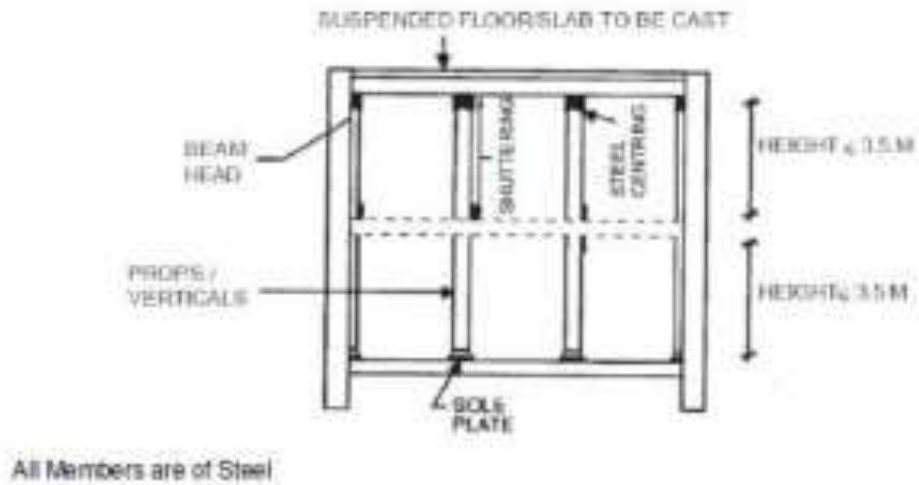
A : Suspended Floor – Multi Stage Shuttering (Vertical Section)
